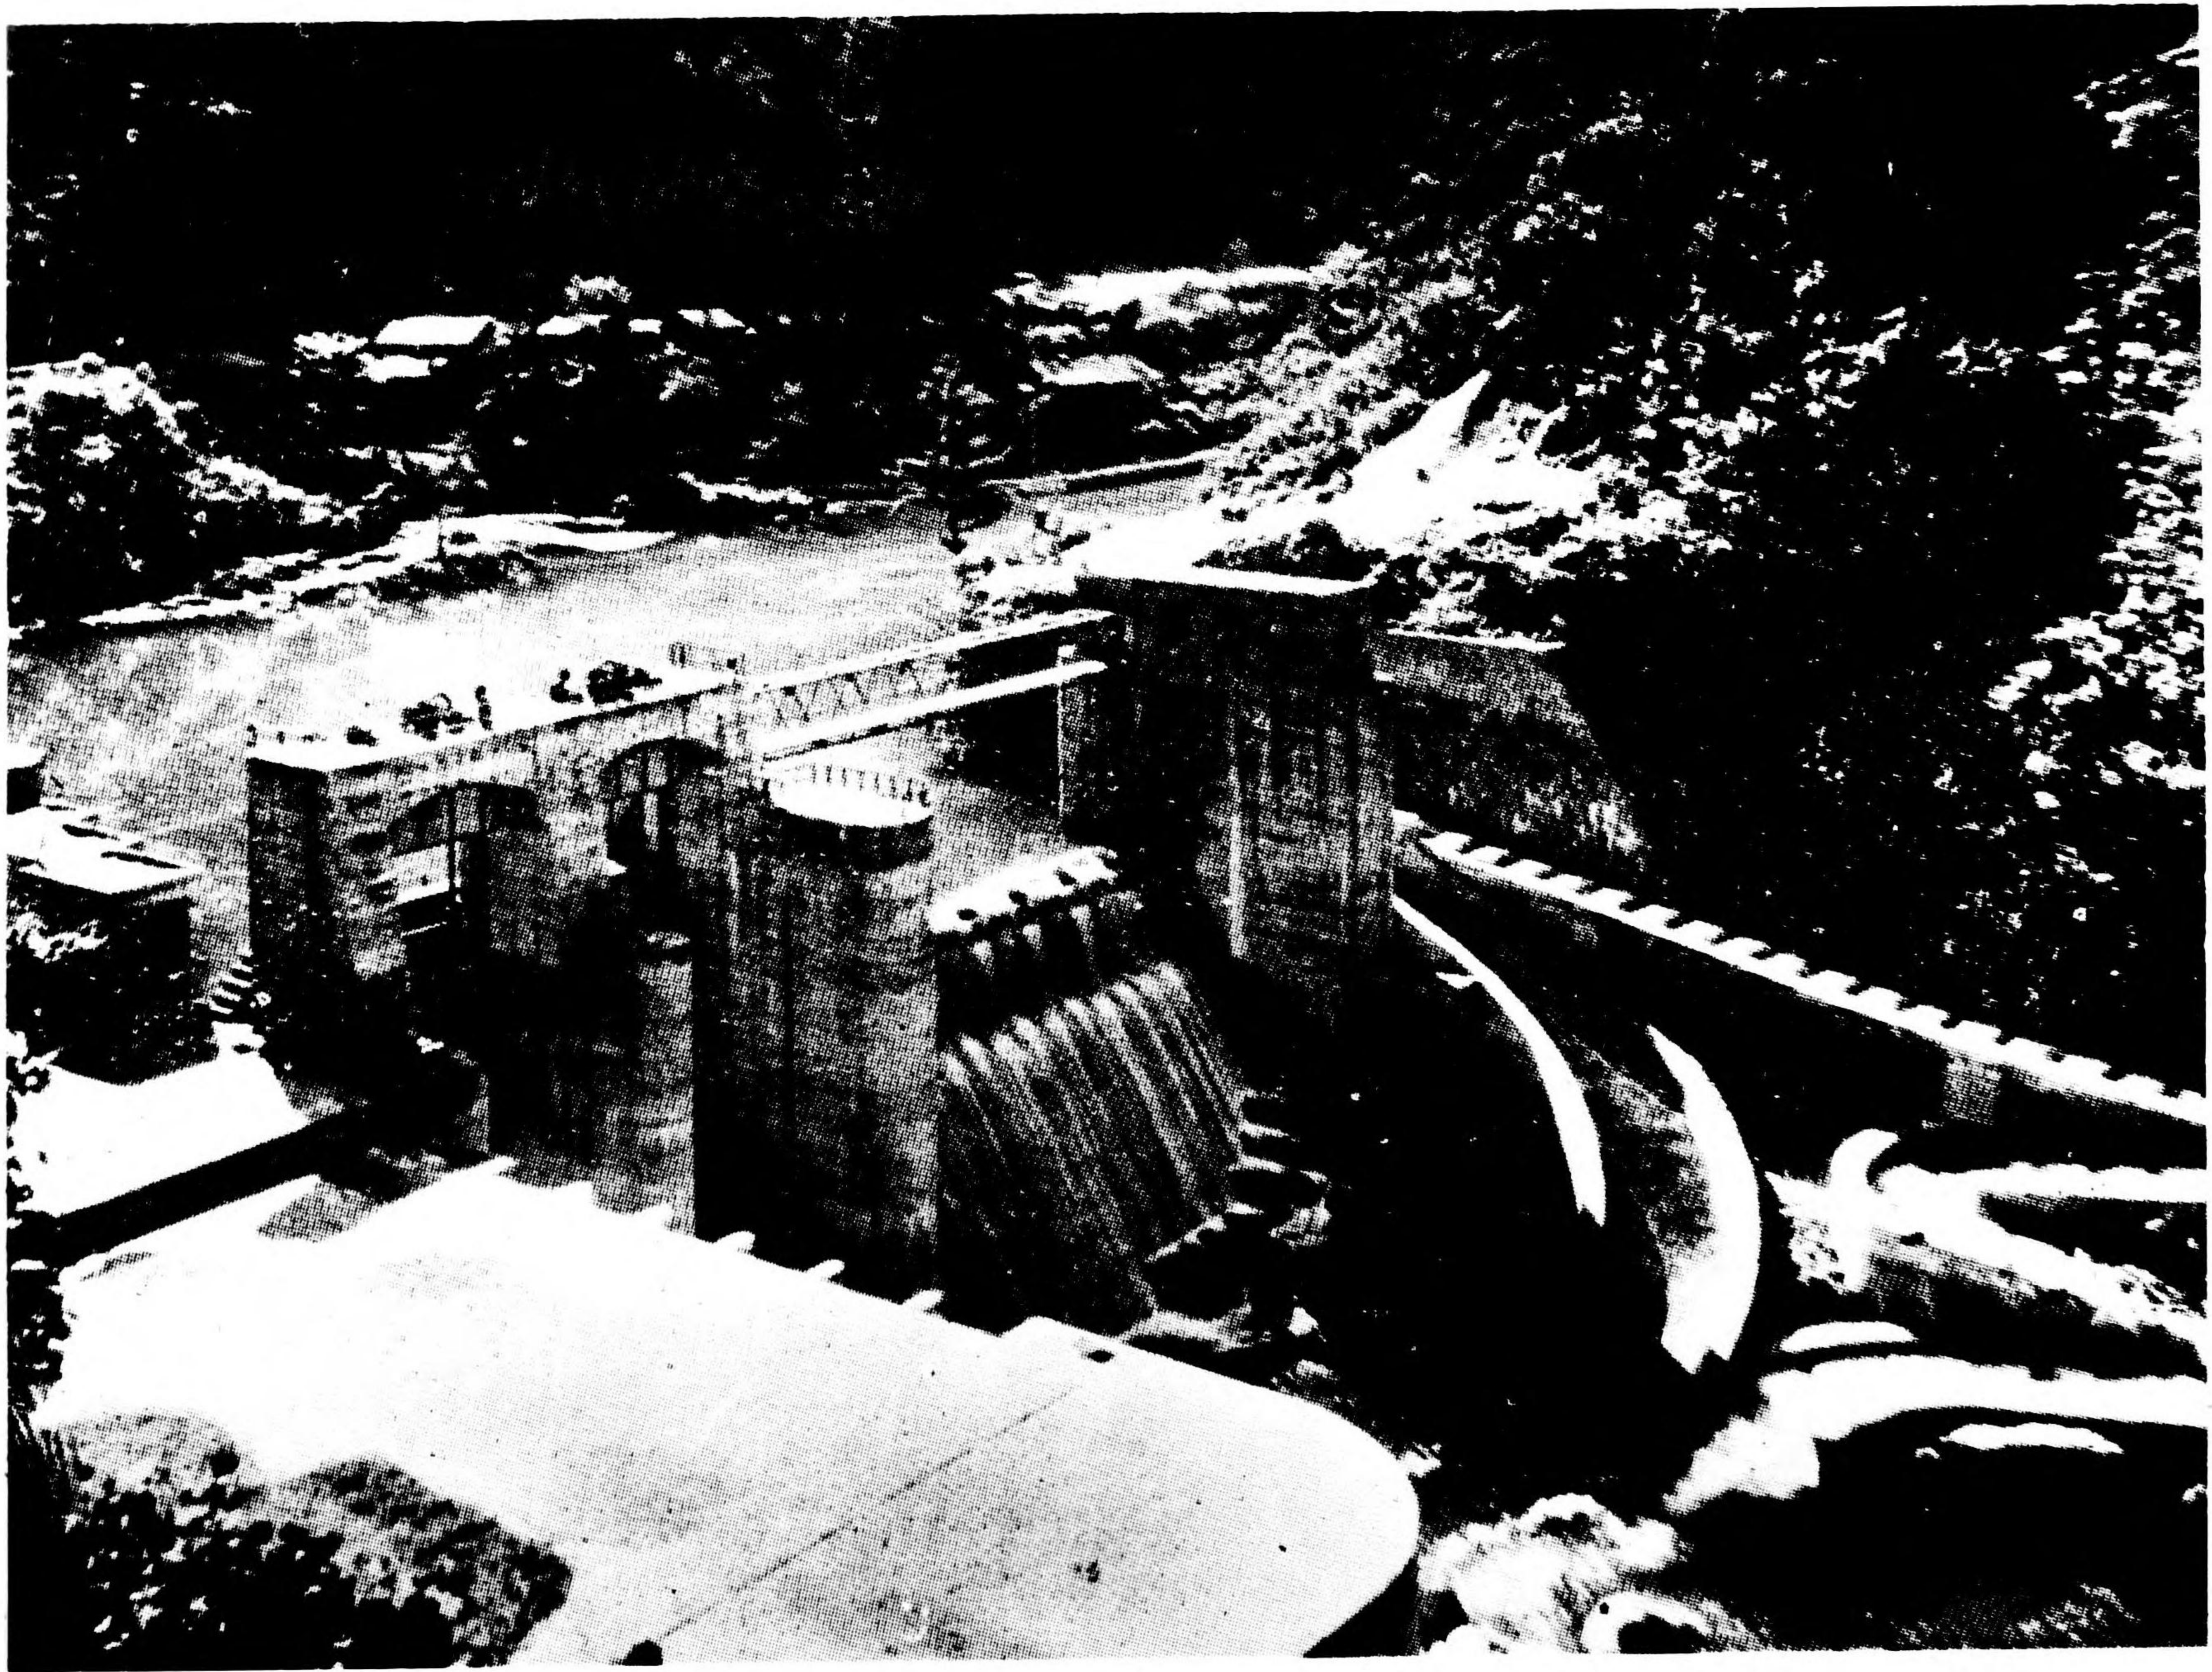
Photograph No. V-92 Yanagawara Hydro Plant under construction in 1927
